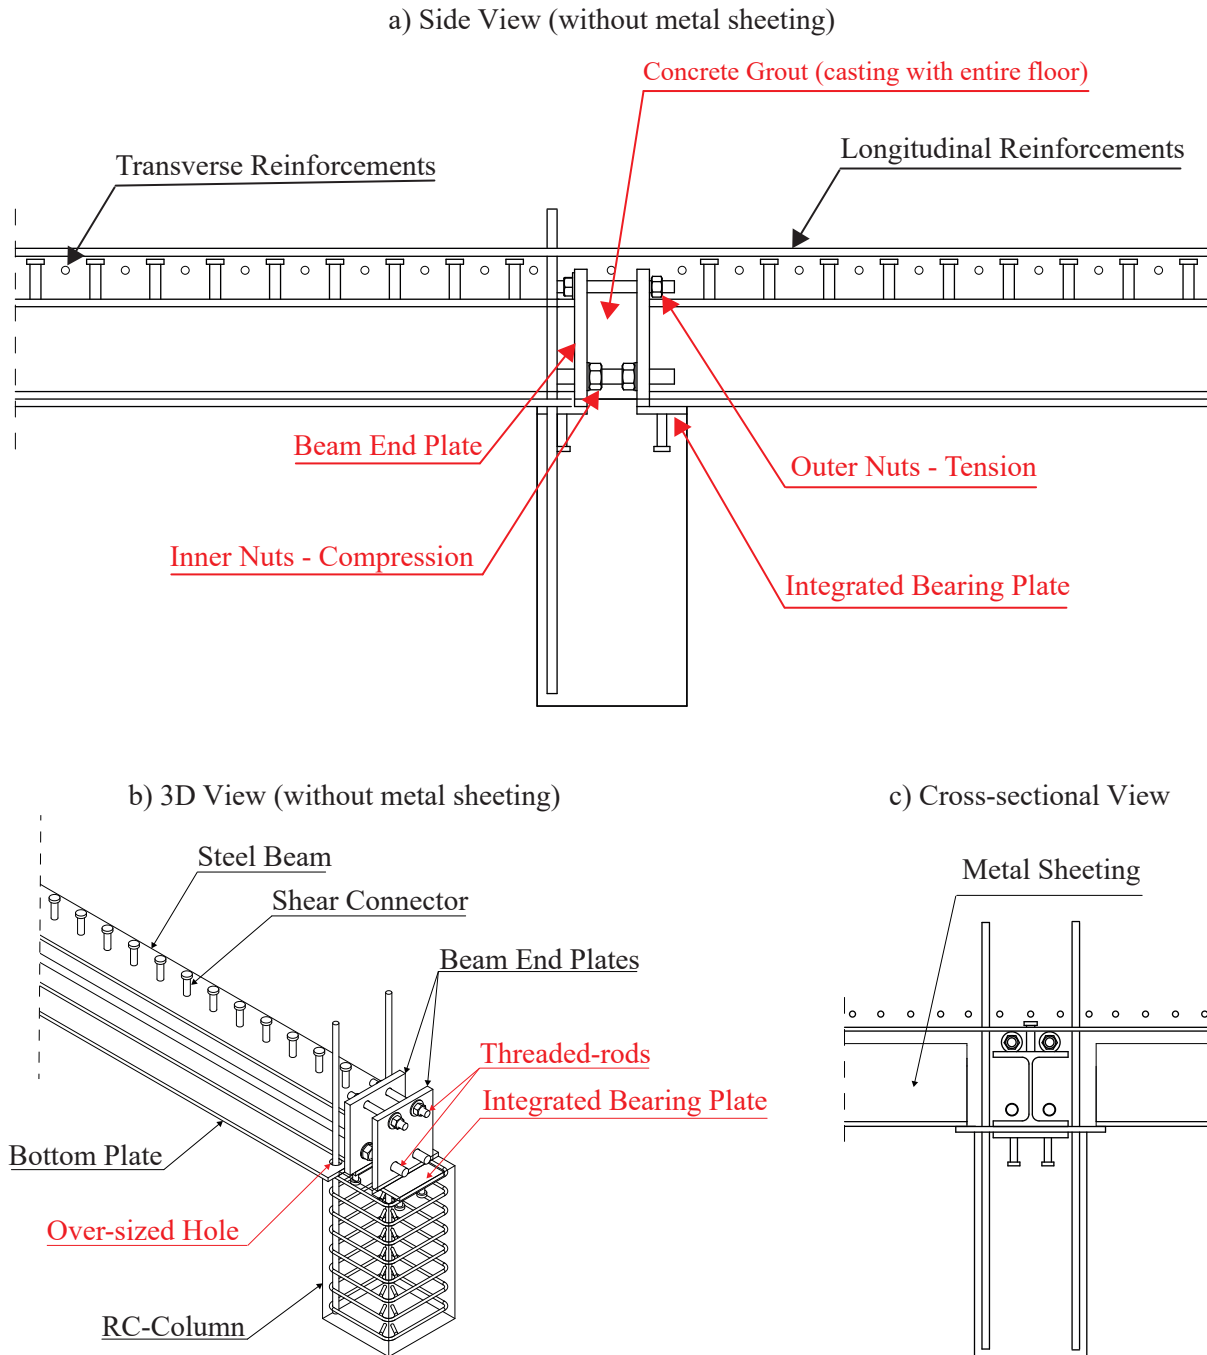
Grouted joint for composite slim-floor beams (GJSFB).
